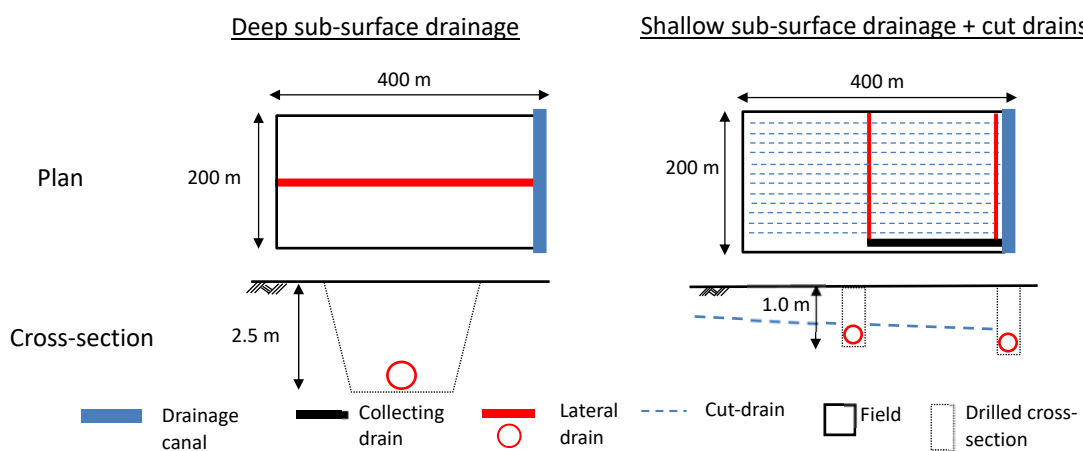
Comparison of deep sub-surface drainage and shallow sub-surface drainage system designs
